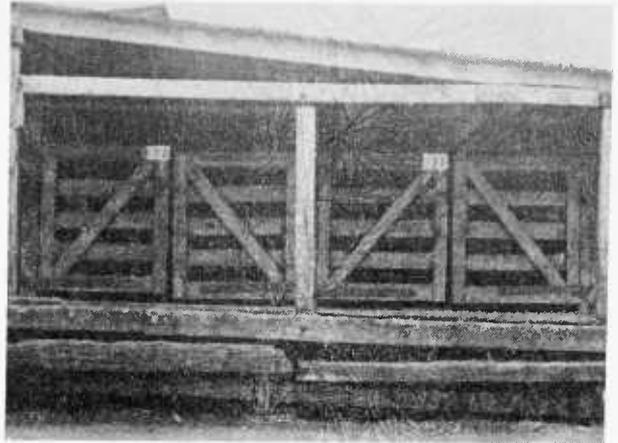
Low dock and head room, 8-foot centers, poor construction.
